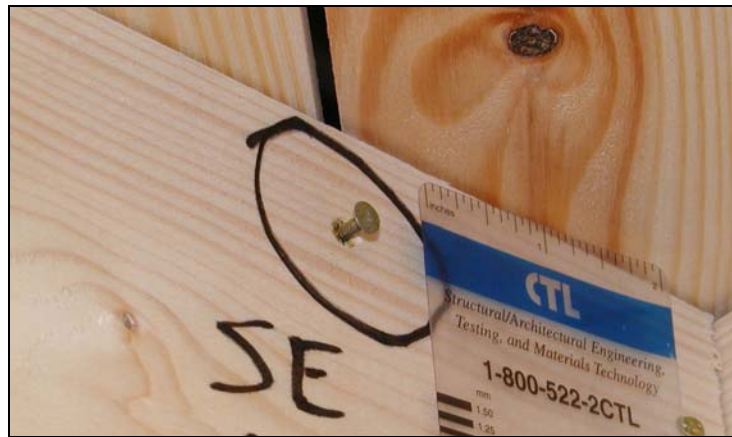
Withdrawal of nail connecting blocking and nailer member, at diaphragm corner (DDR = 1.1 %, southeast corner)
